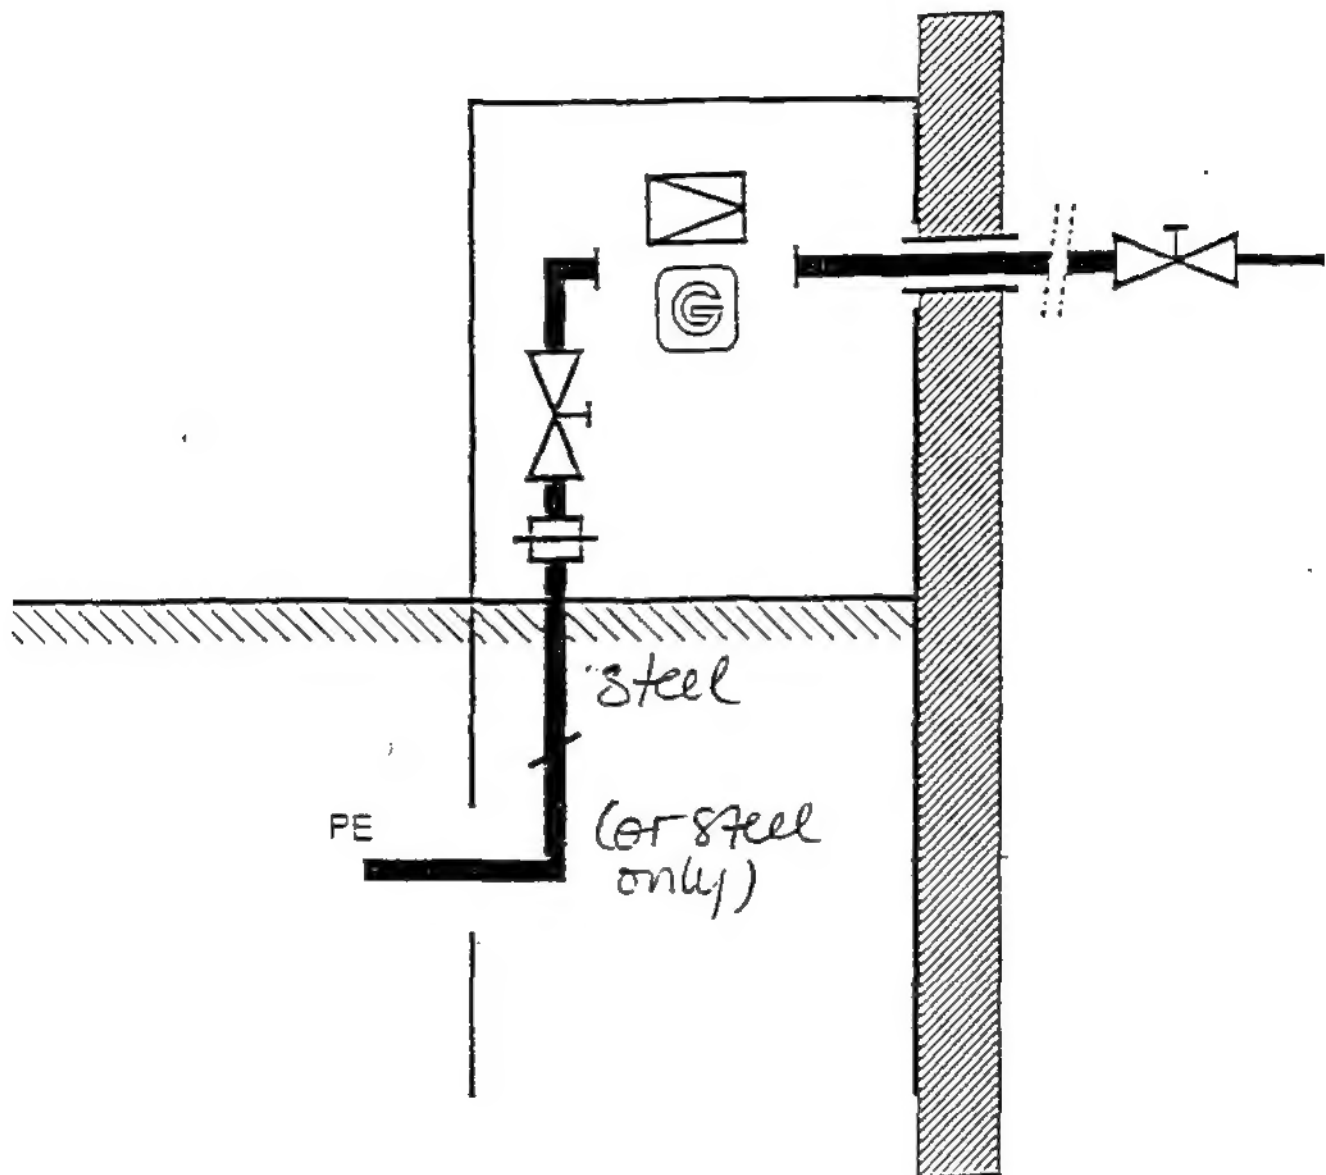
No insulating joint in control box and/or meter case at or in the exterior house wall; house-connection line made of steel or PE - transition to steel immediately at the inlet into the box (case)
